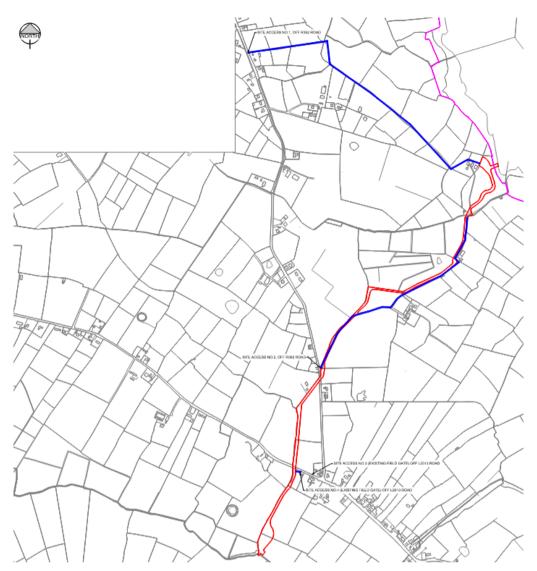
Roads context and potential site entrances for construction of the proposed scheme. Source Dwg. 24821-MWP-00-00-DR-C-0002 (MWP) | not to scale
